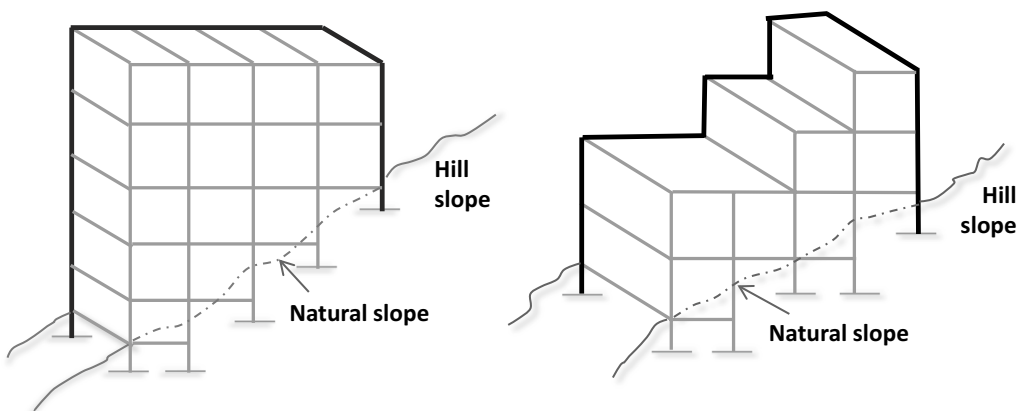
Building on slope ground (modified after Paul and Kumar 1997)
